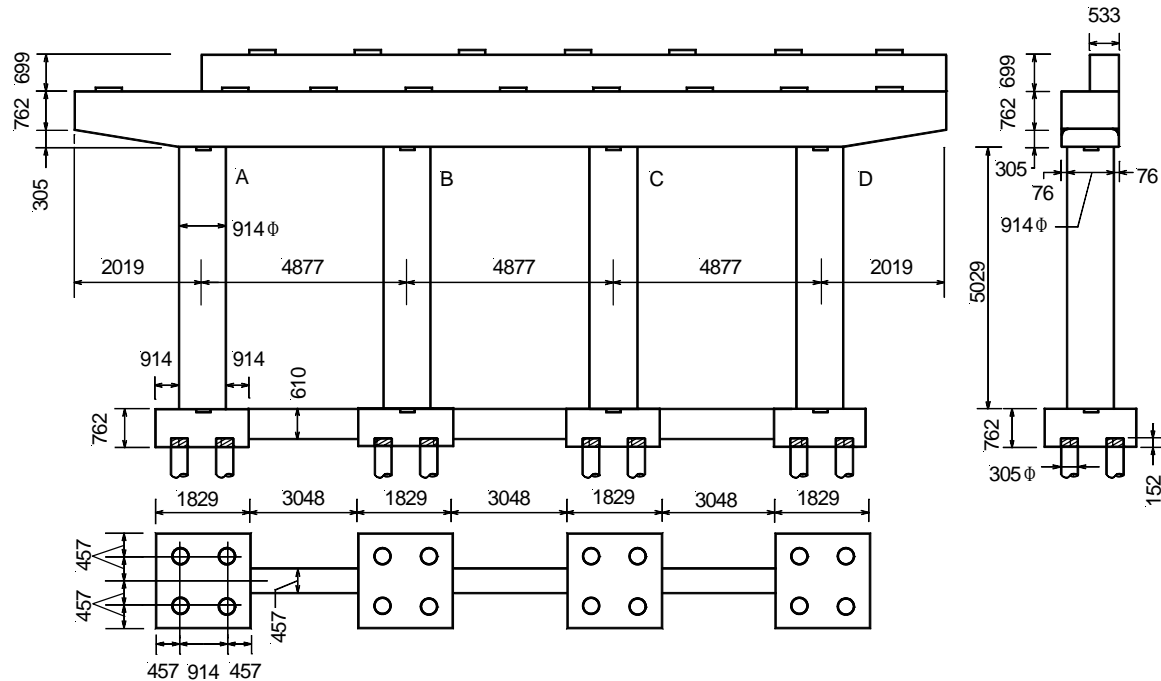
Dimensions of typical bent of State Street Bridge on Interstate 80.
